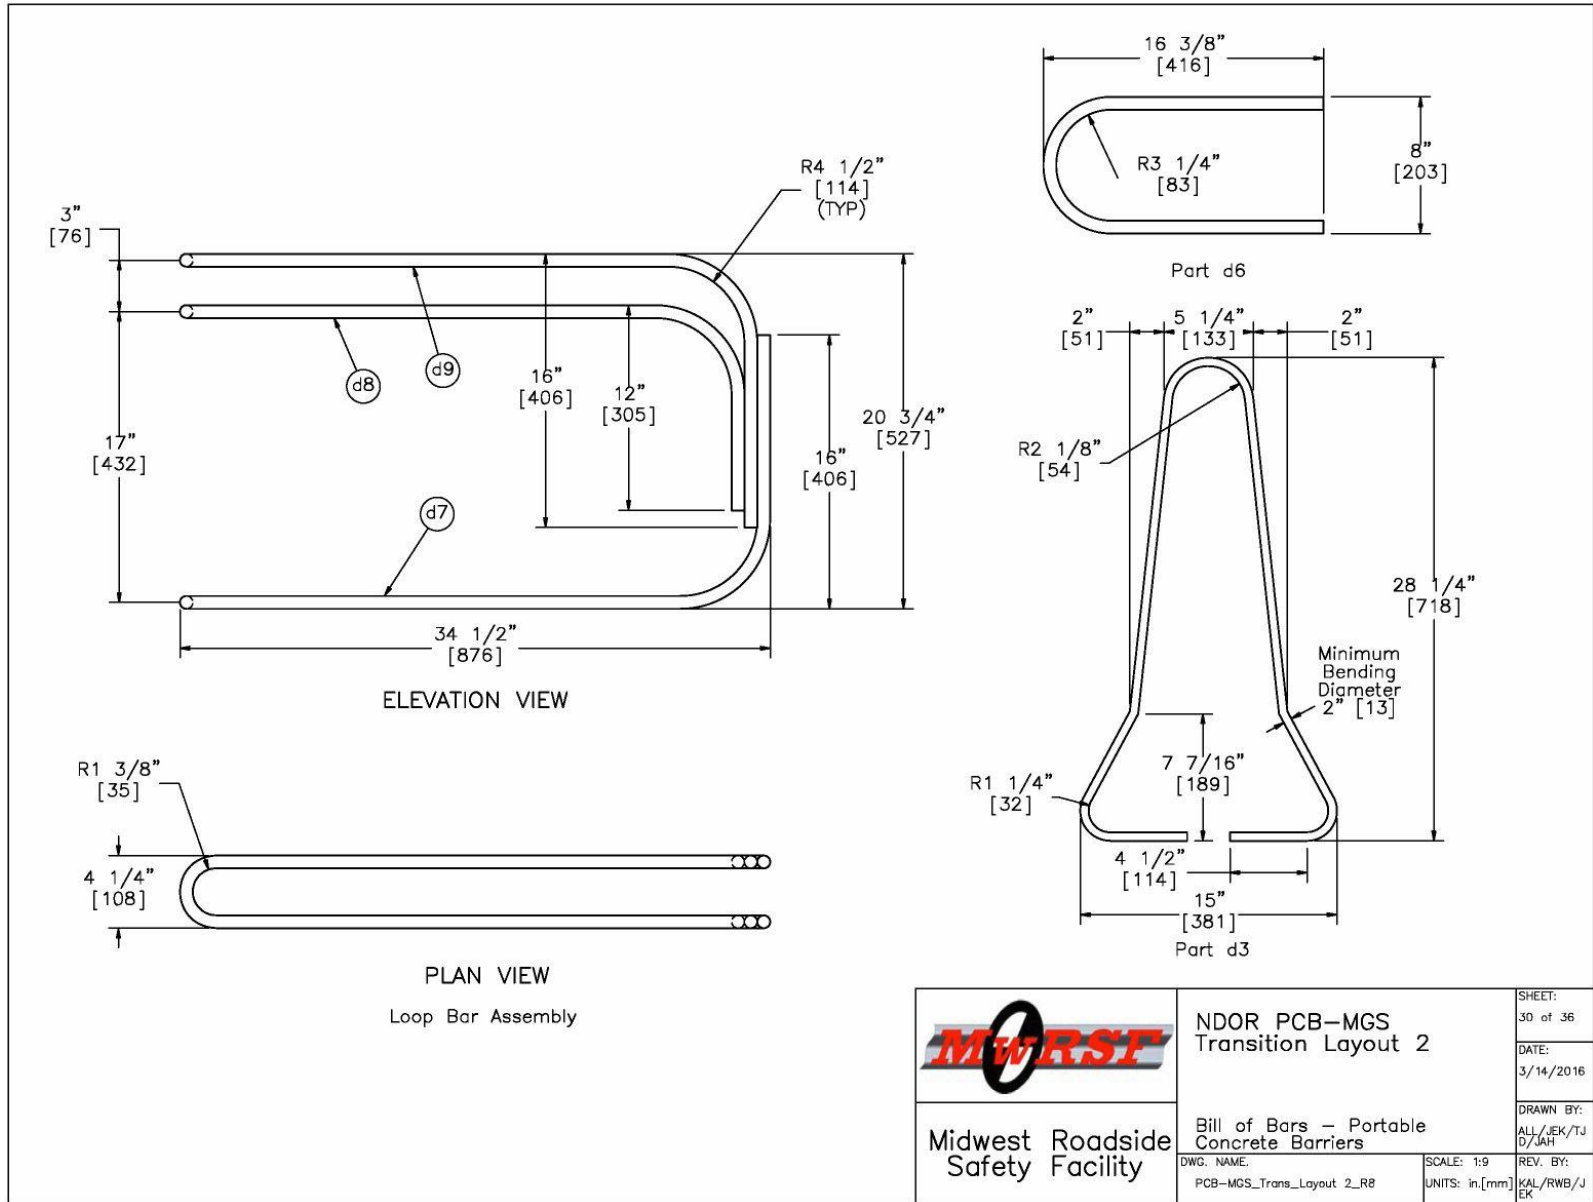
Bill of Bars – Portable Concrete Barriers, Test No. MGSPCB-1
